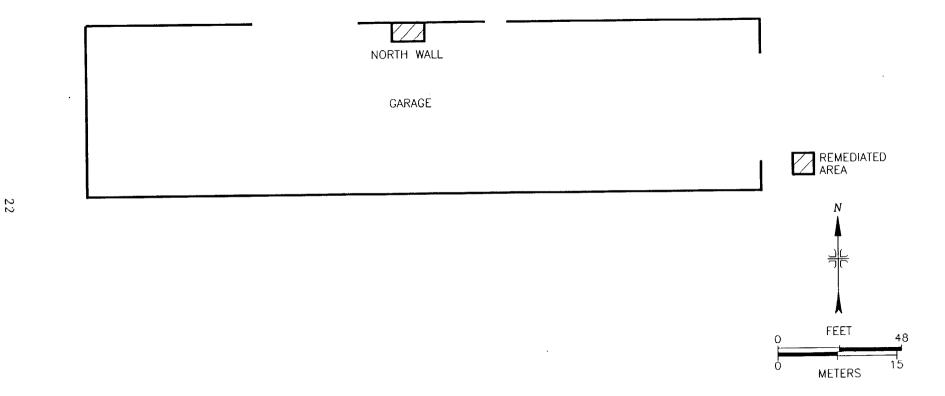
Layout of Building 19, Indicating Location of Remedial Action
